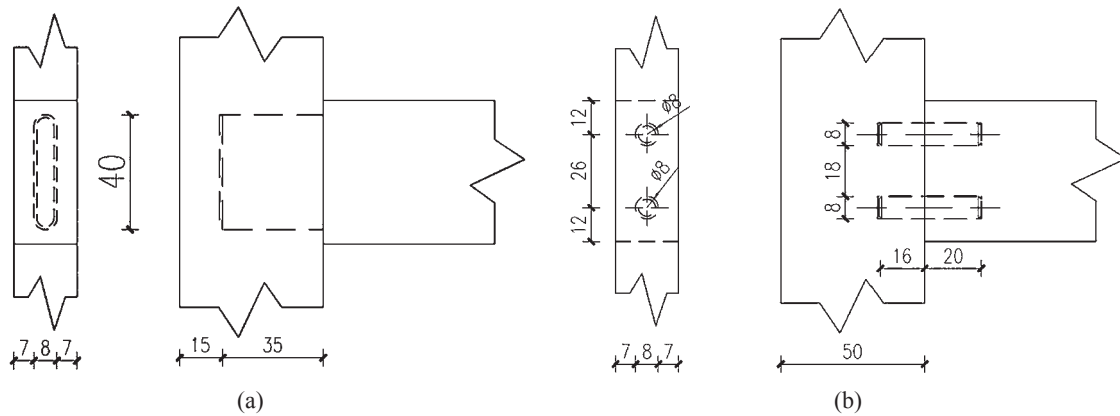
MT (a) and dowel (b) joints details (dimensions in mm)
